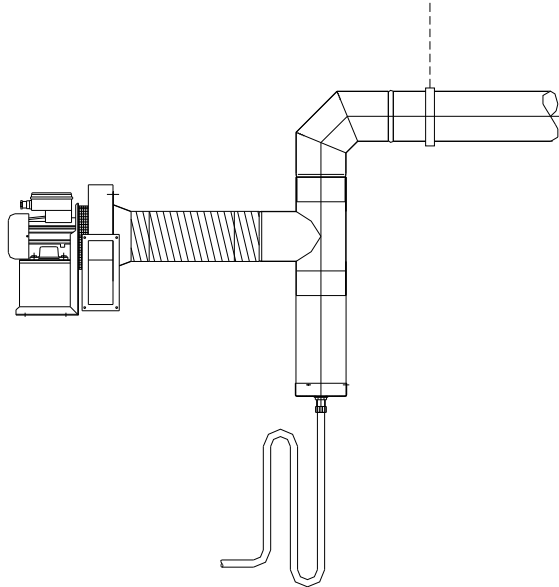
Stainless Steel Telescopic Through The Wall Arrangement (available for Type 'O' and Type '2' fans)
